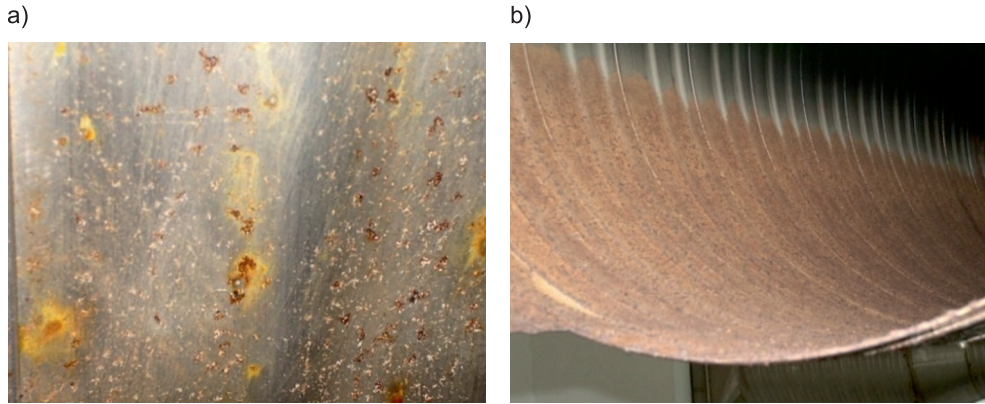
Pitting corrosion: a) visible micro-cracking and pinholes; b) deposits of corrosion on the surfaces of ventilation ducts [18]
